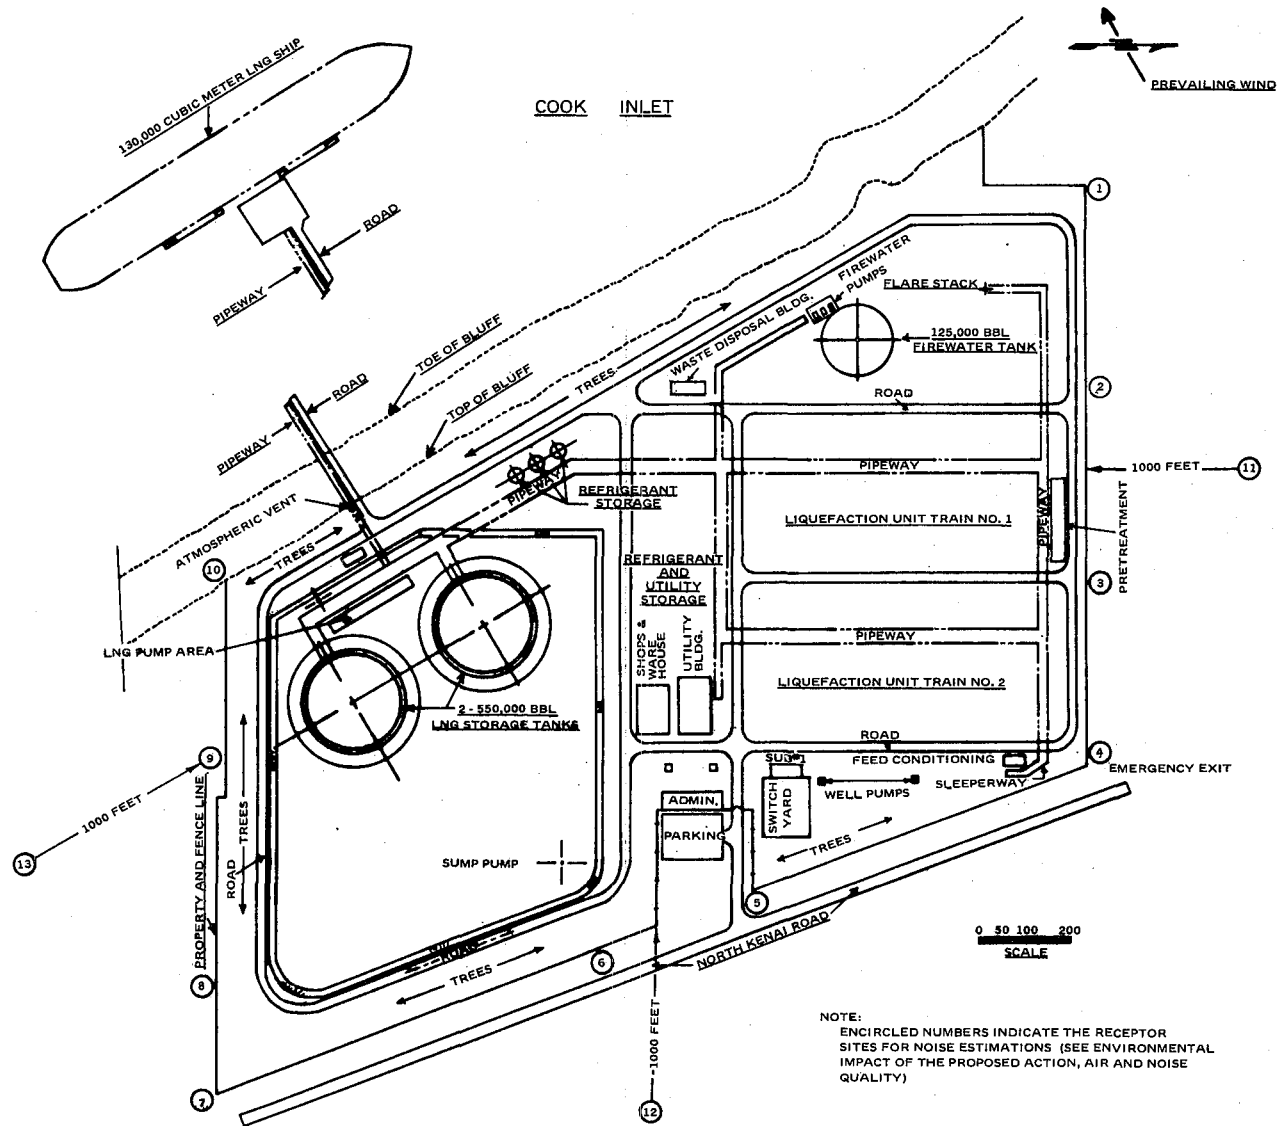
Proposed Nikiski Liquefaction Plant Plot Plan
